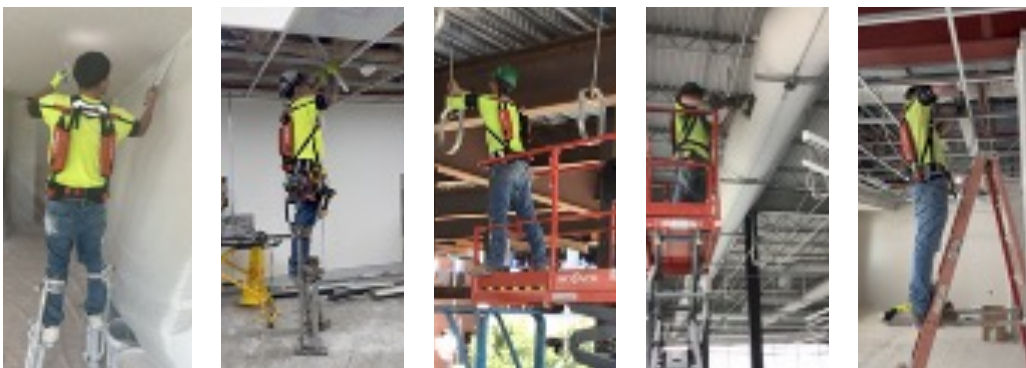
Trade-specific tasks performed using an arm-support exoskeleton: (a) residential drywall, finishing ceiling (knock down); (b) commercial drywall, installing ceiling grid; (c) plumber-pipefitter, installing hangers in ceiling; (d) sheet metal, sawing/cutting register opening; and (e) electrician, installing light fixtures.
